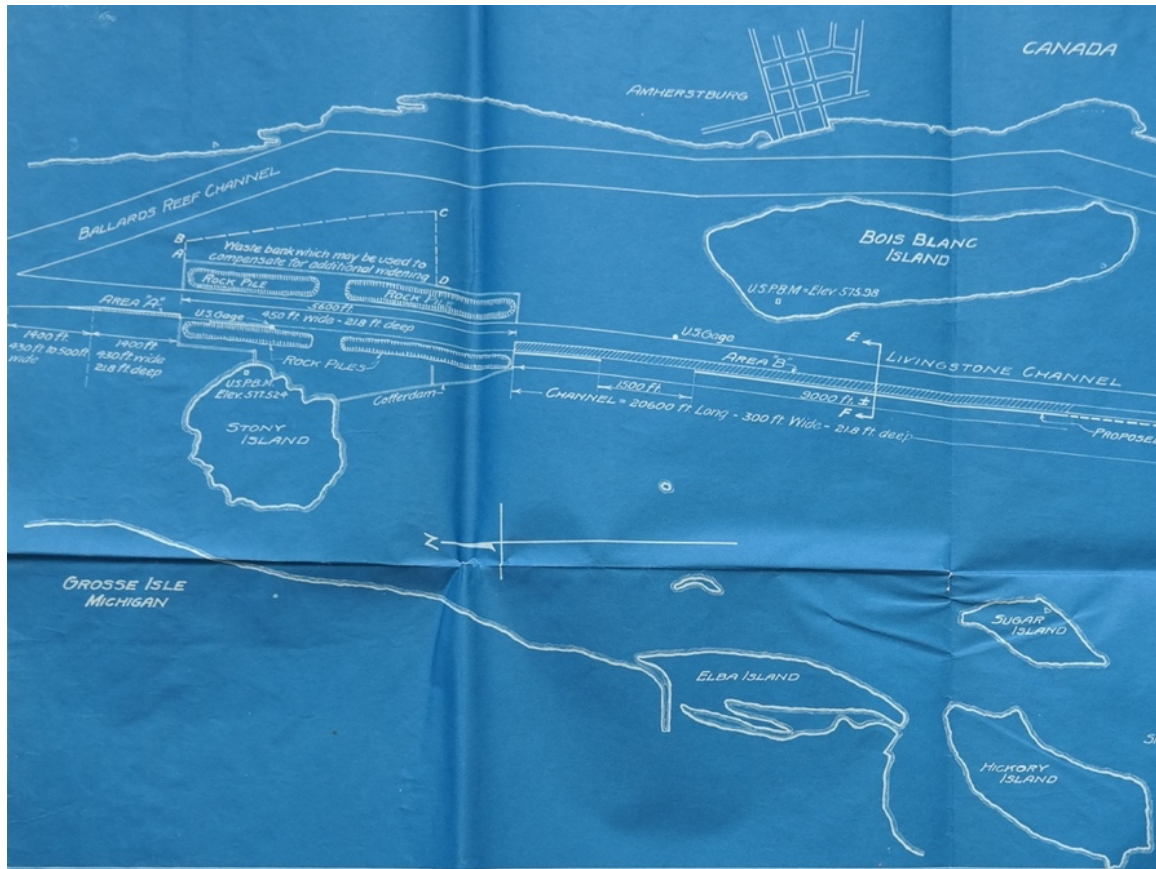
Planned dikes and compensatory works in Improvement of Livingstone Channel, Detroit River.
